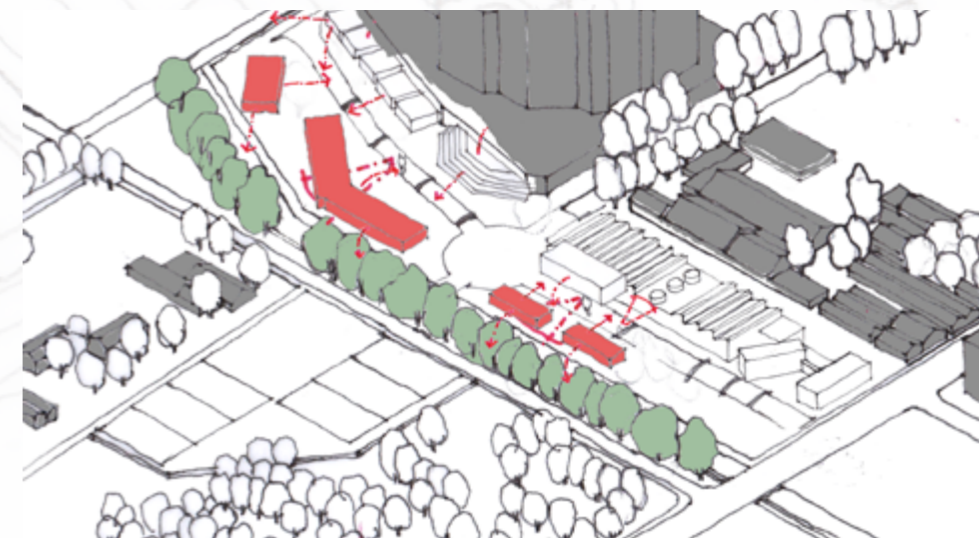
Pavilion - Creek Connection (Author, 2021)
